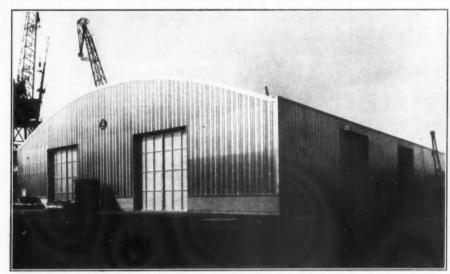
'B' Shed. Millwall Dock (Outer)-Span 110-ft.
